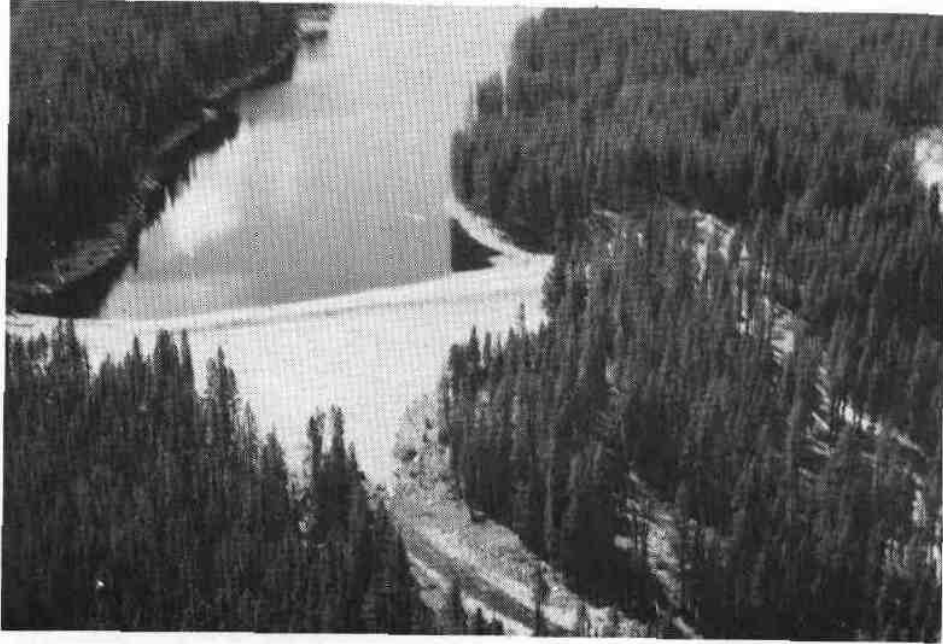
ISINTOK LAKE - Looking Southwest (Sept. 12, 1973)
